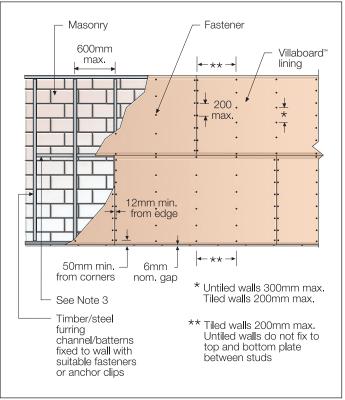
BATTEN / FURRING CHANNEL - HORIZONTAL LAYOUT
